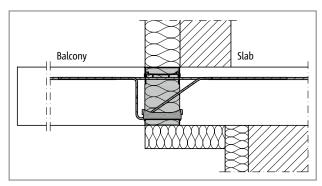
Schöck Isokorb® XT type K: Connection with indirectly positioned floor and thermal insulation composite system (WDVS)
